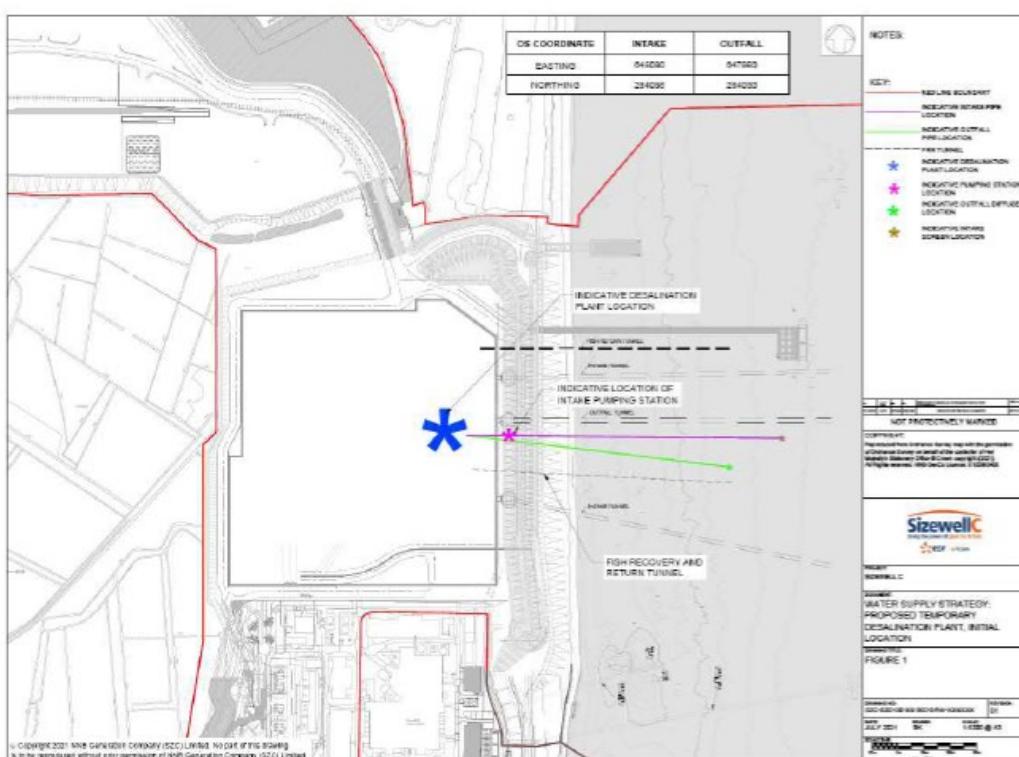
Indicative construction phase desalination intake and outlet plan (Figure 201 from NNB GenCo, 2021h; TR552)
